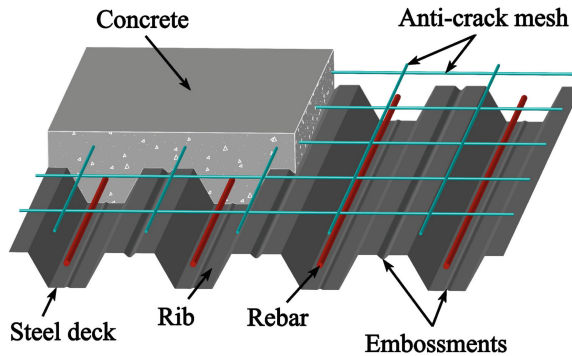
Typical layout of a composite slab with trapezoidal steel deck.
